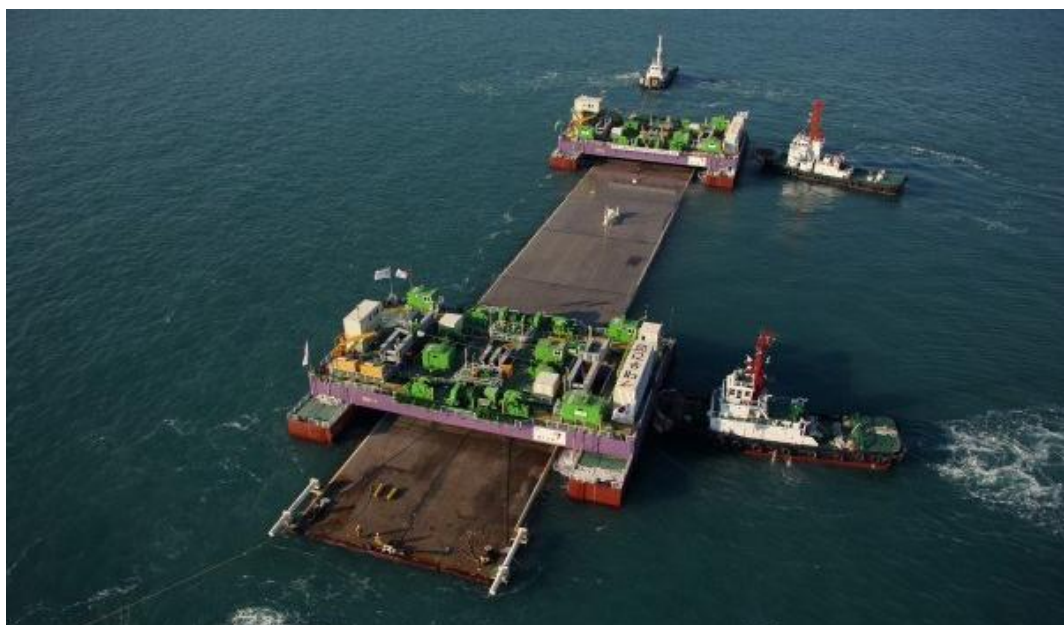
Immersed tunnel installed by pontoons (www.struktonciviel.com)
